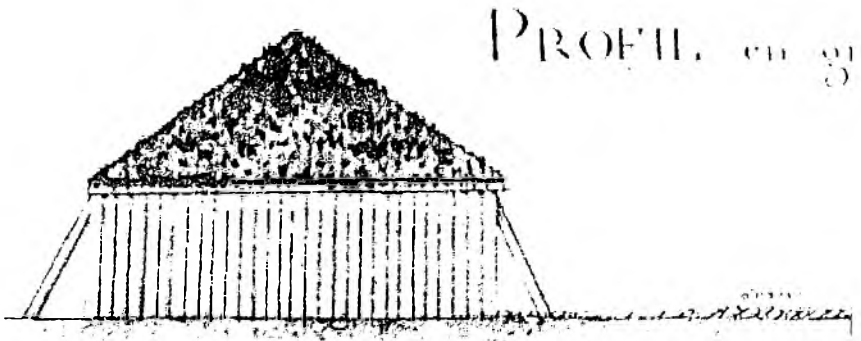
Illustration of a piquet building from a Louisbourg plan dated 1740. A.N., Col., C11A, vol. 126, fol. 232.
